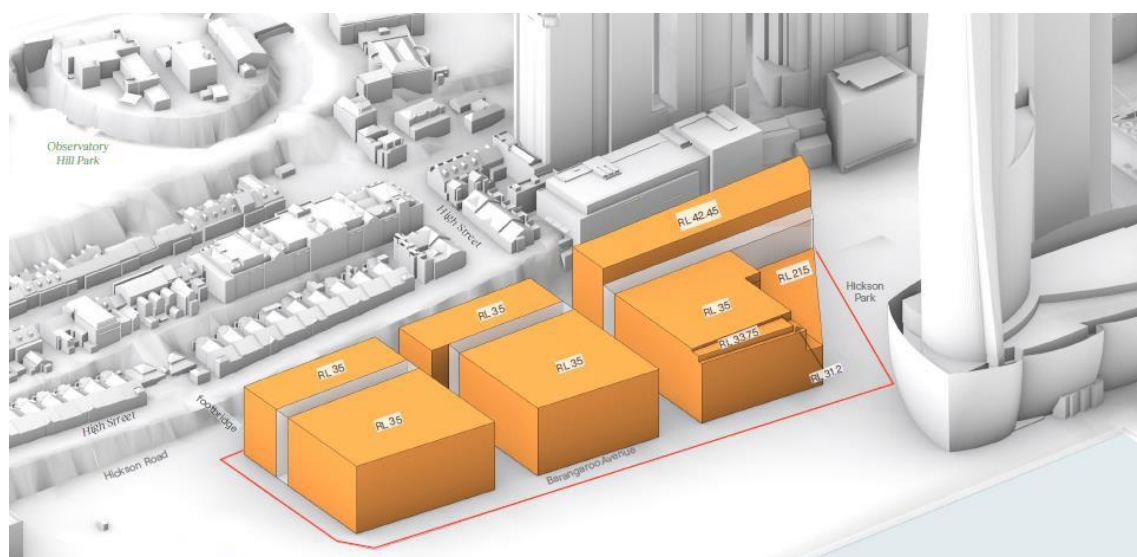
Mod 9 Proposed Building Envelope with RLs. (Source: *Central Barangaroo Urban Design Report and Design Guidelines*, prepared by SJB, 28 November 2023).
